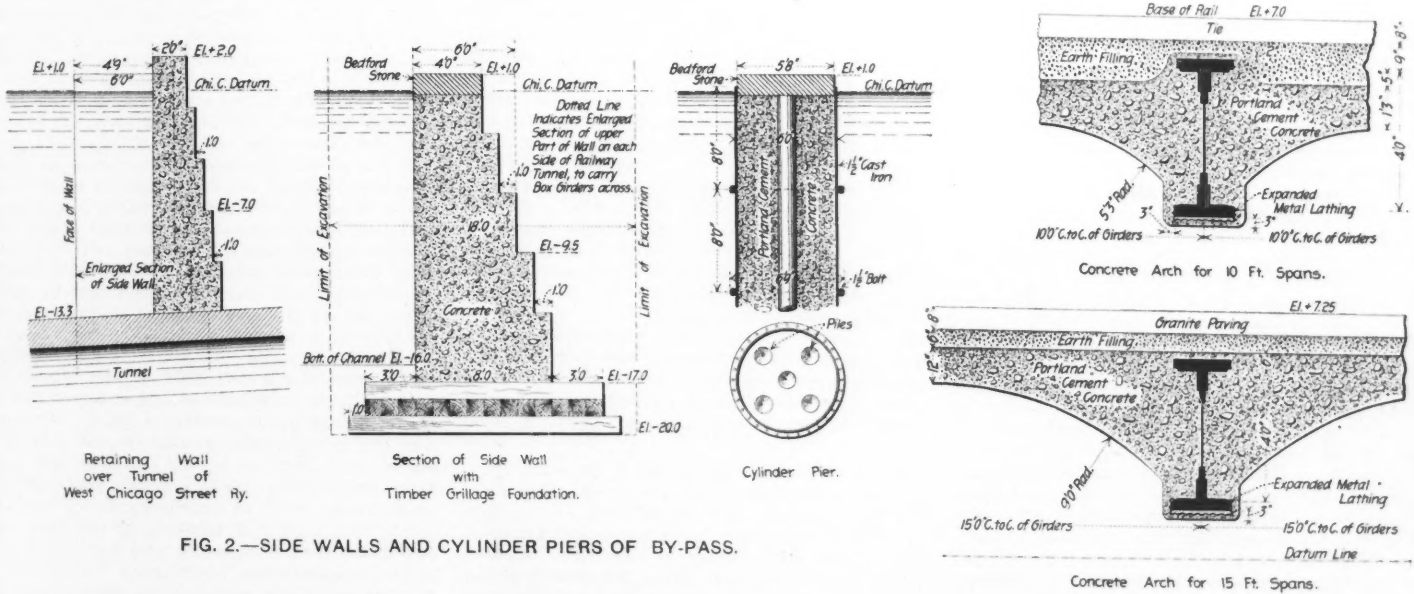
SIDE WALLS AND CYLINDER PIERS OF BY-PASS.
